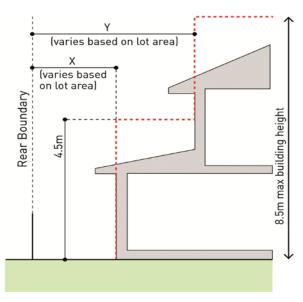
Section showing the minimum rear setback requirements for dwelling houses (the maximum allowed building envelope is shown in red)
